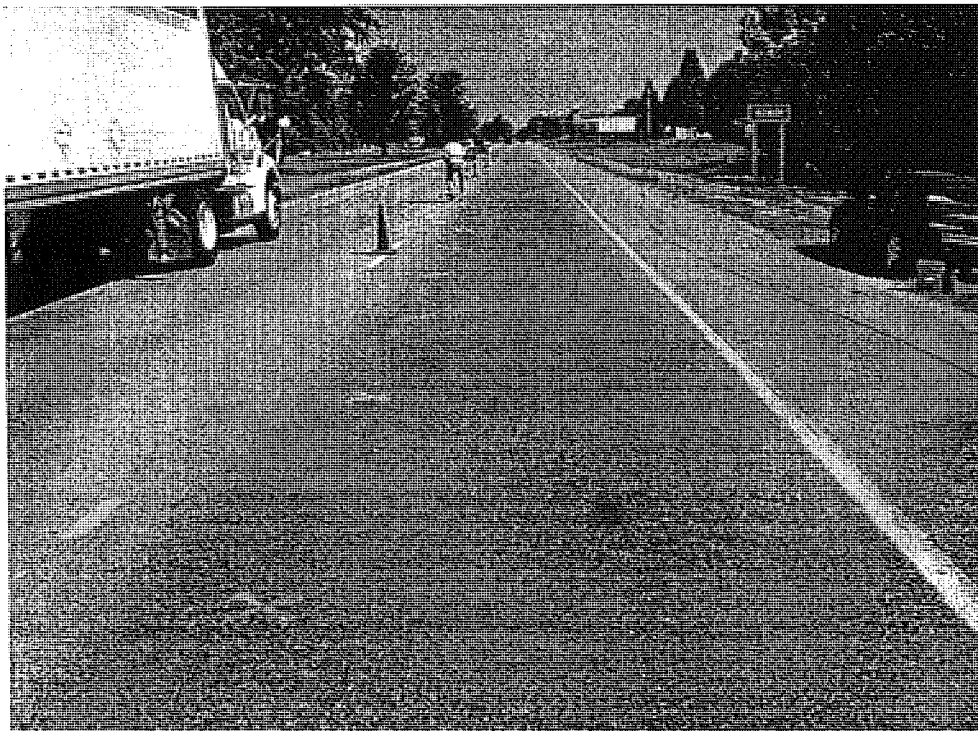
US-31 NB section 1 test site 1 before the intersection between US-31 and M-45
